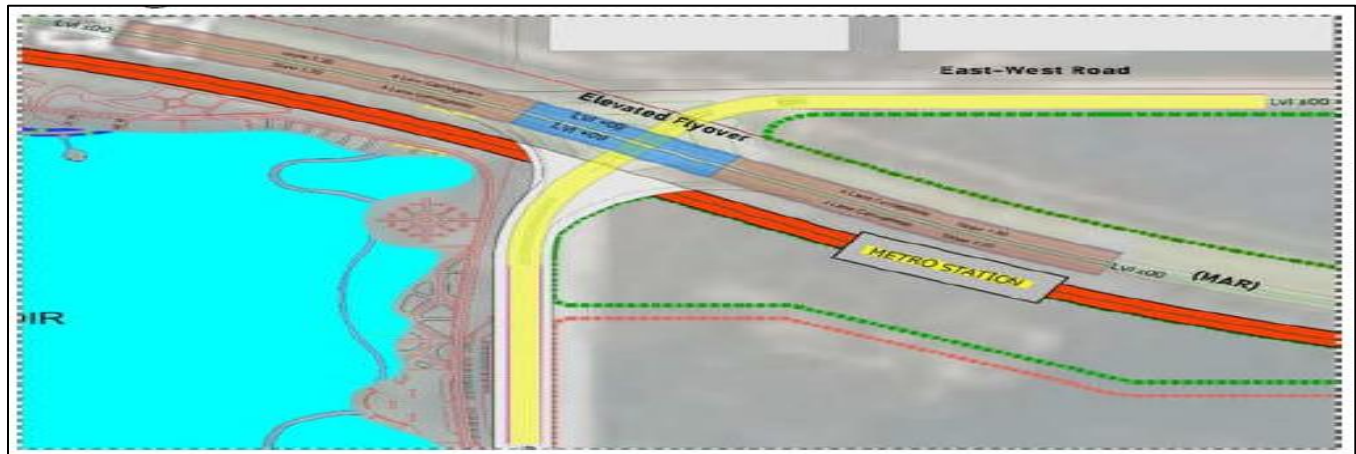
Proposed Layout of Elevated Flyover and Underpass along the East-West Road and Main Access Road (MAR)
